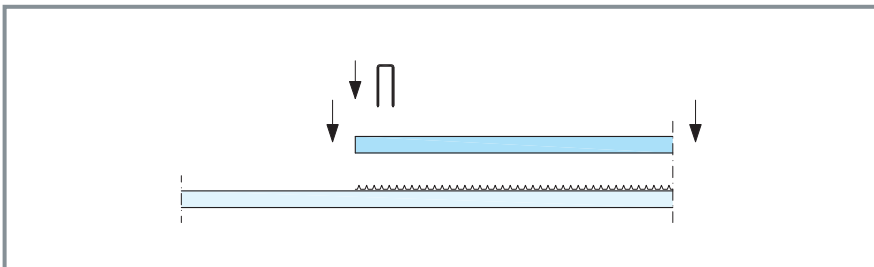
Prefabricated screed made of two layers of special gypsum board
